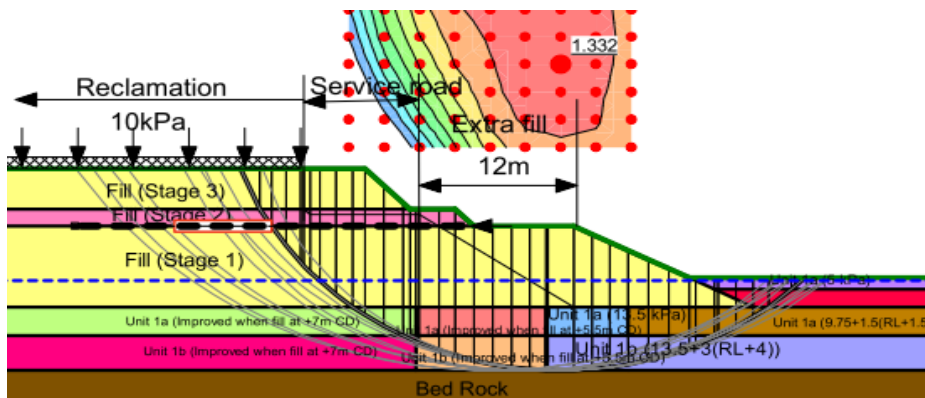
Slope stability model for +10.5 mCD level fill (Circular failure) – Construction stage
